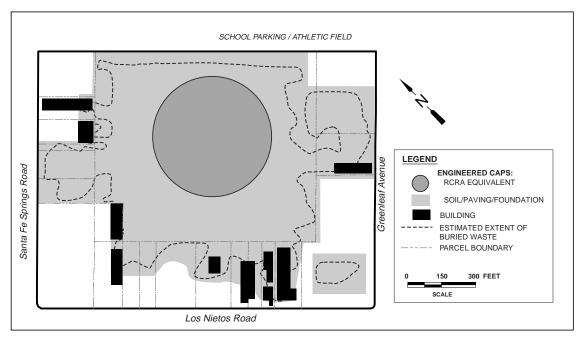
WDI, Inc. Superfund Site, showing contamination and scheduled construction work
